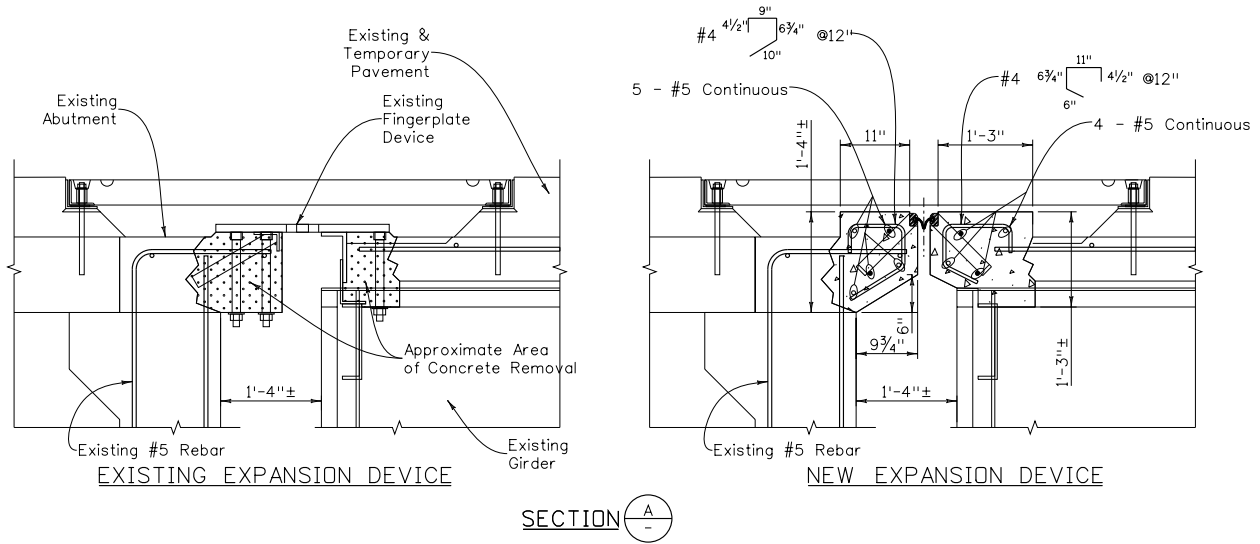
(B)-2 Sample Sections showing existing and proposed expansion joint devices
